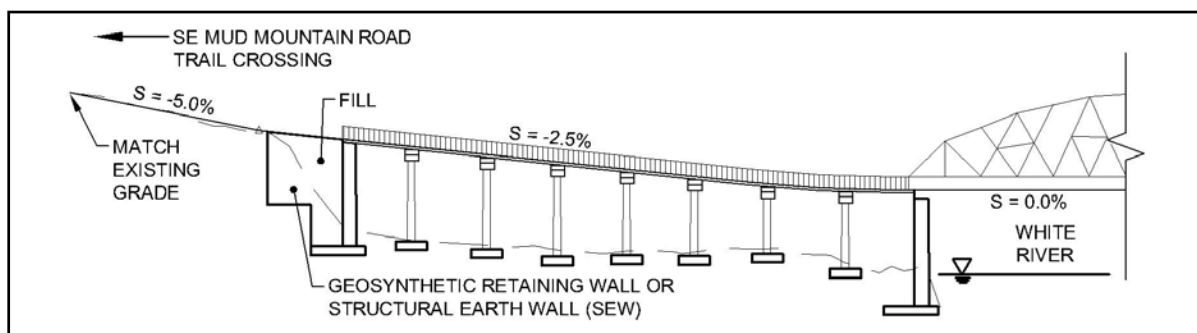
Northern White River Bridge Trail Approach – Alternative 2, Elevated Structure
